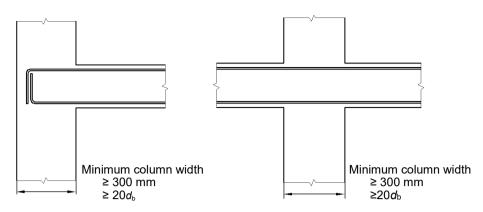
MINIMUM SIZE OF RC COLUMNS BASED ON DIAMETER OF LARGEST LONGITUDINAL REINFORCEMENT BAR IN BEAMS FRAMING INTO IT
